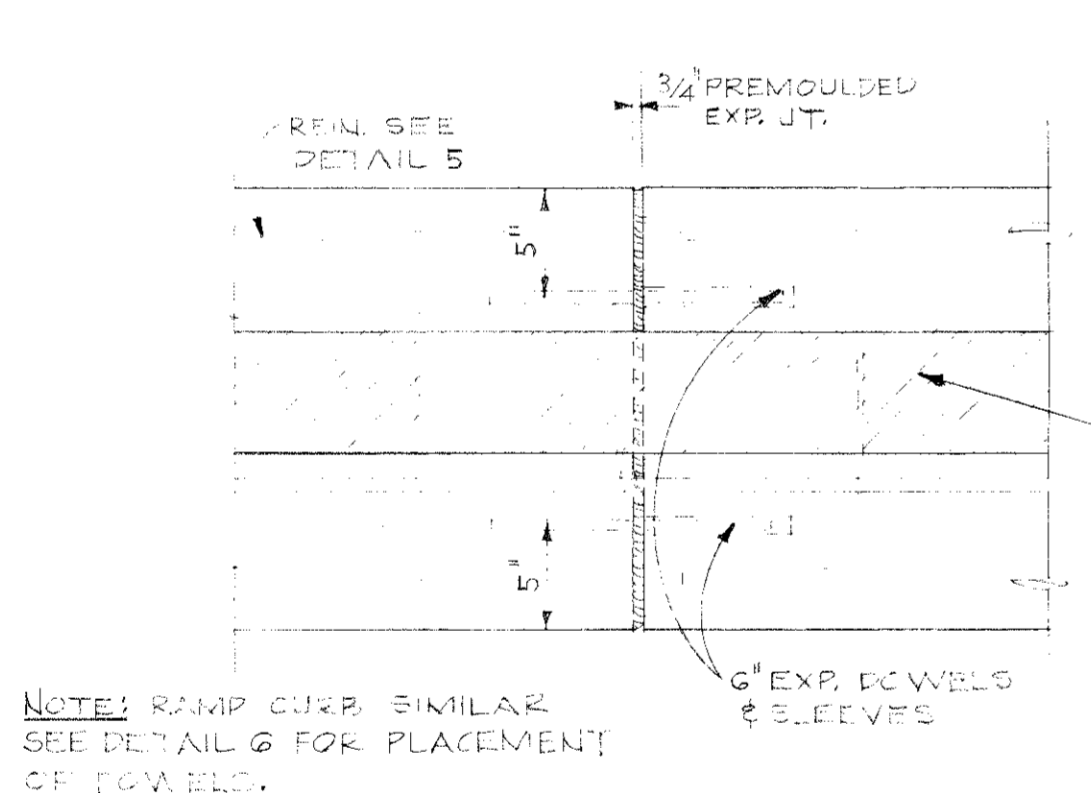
SCALE: 1 1/2"=1'-0"
